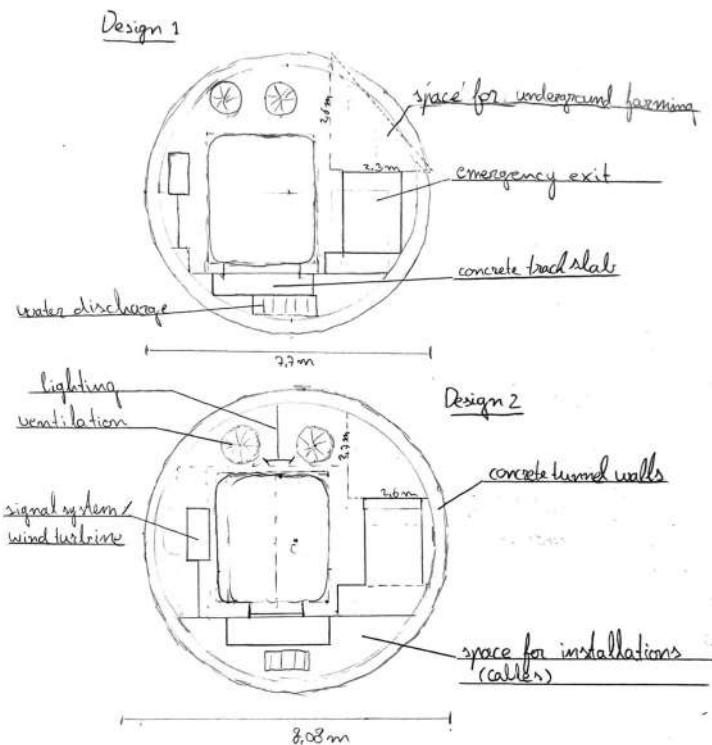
Sketch of Metro tunnel with proposed underground farming (Team A2-Sustainability & Hydraulics Team, 2022).
